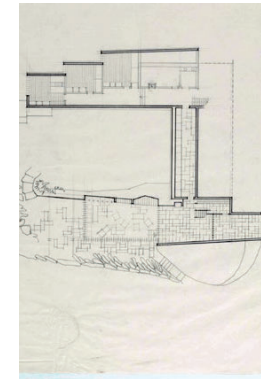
Floor plan and Elevation plan of the Mountain School in East of Tretten, Gudbrandsdal, Norway.
